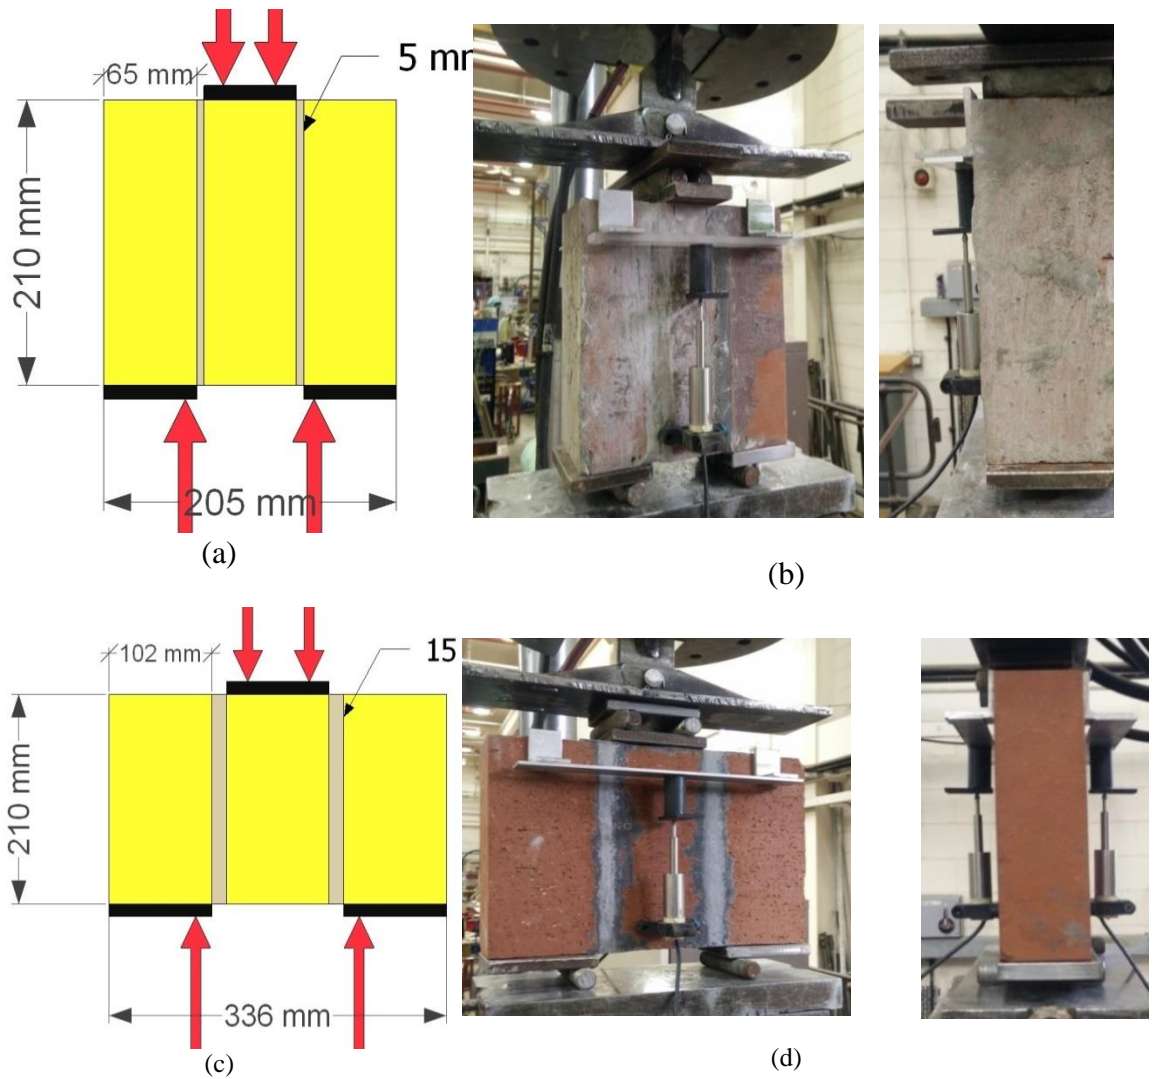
Triplet shear test: (a) dimensions of SBM specimen, (b) test setup for SBM specimens, (c) dimensions of SBE specimens, (d) test setup for SBE specimens
